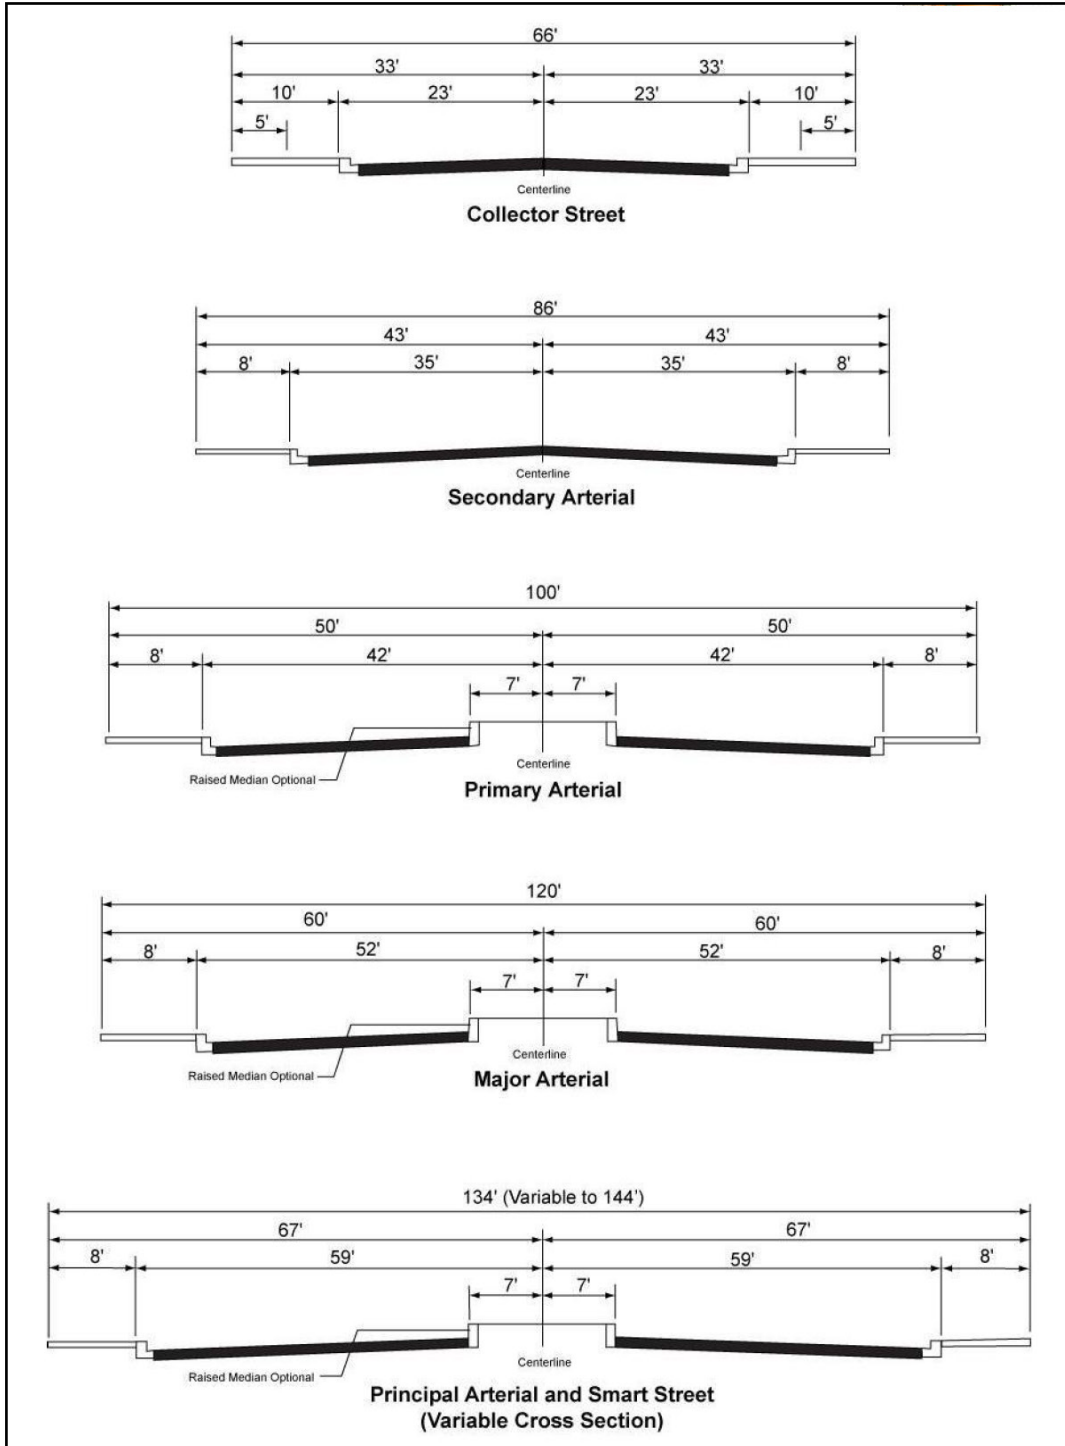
CITY OF ORANGE GENERAL PLAN ROADWAY CROSS-SECTIONS
